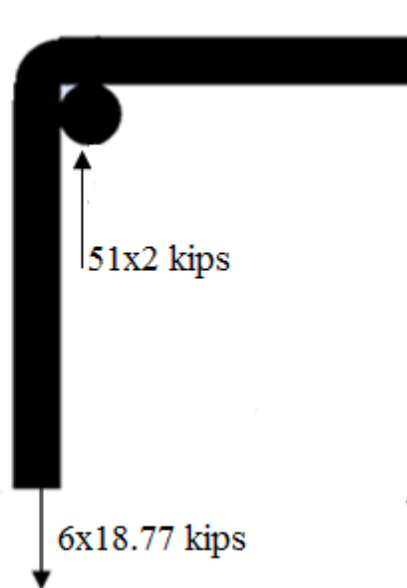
Stirrups used to Transfer Load to shear Connectors Group
